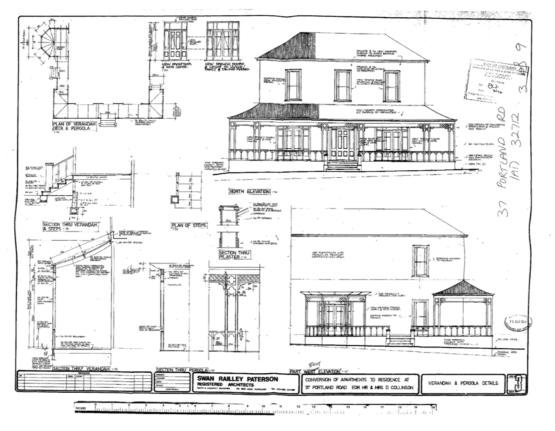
Plans and elevations showing the works associated with converting Glenholm back to one residence, including restorative works such as verandah and staircase reinstatement (B/1980/4865 – Building Consent plan – O/32712/01, Auckland Council property file: 37 Portland Road, Remuera).
